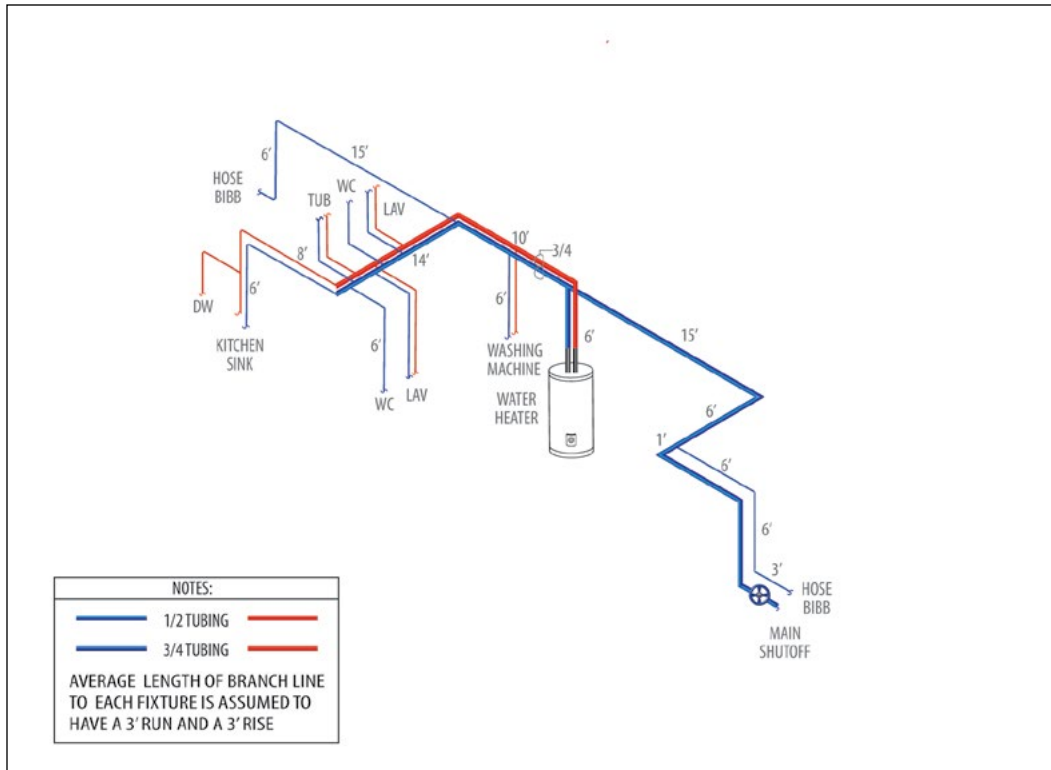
Trunk and Branch Isometric Riser for the Townhouse
